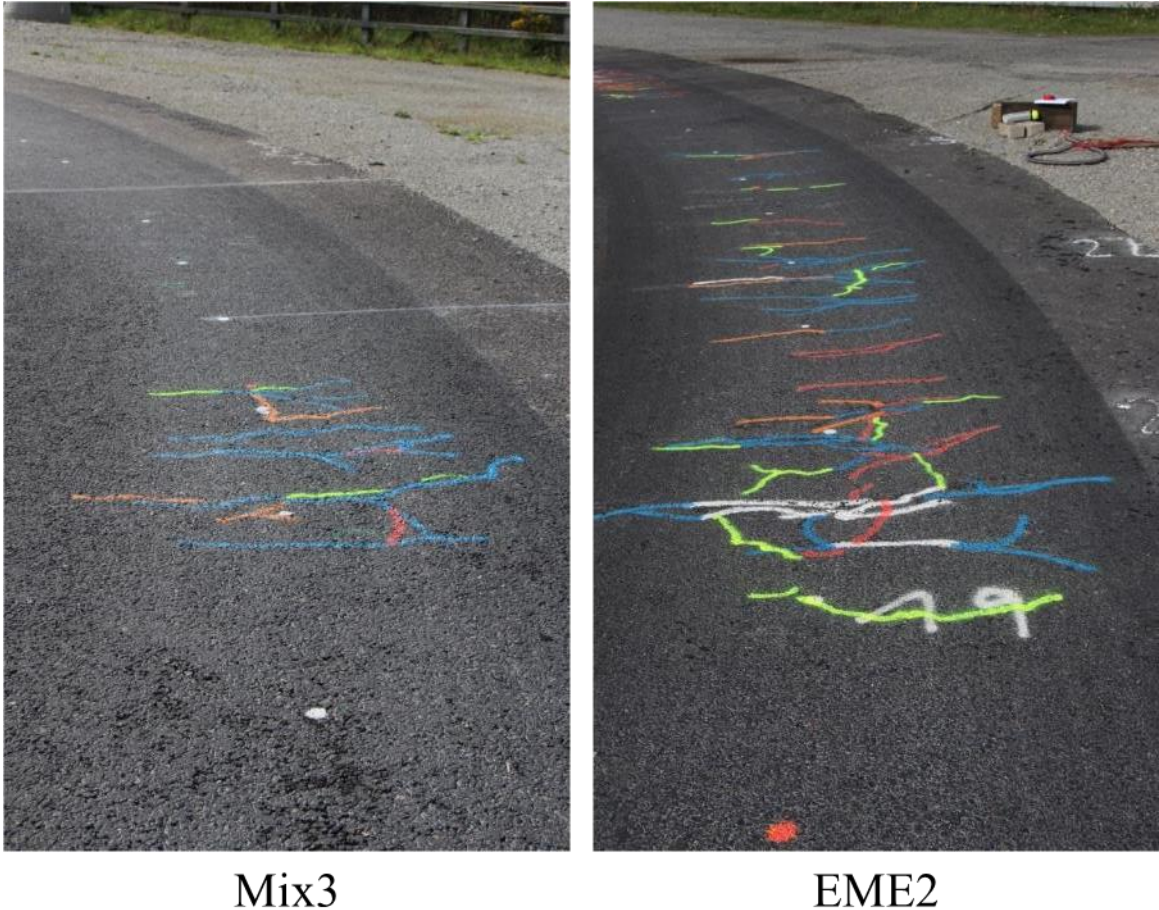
Pictures of the damaged sections at the end of the test (1.4 million loads). (Left) Mix3 section; (Right) EME2 section.
